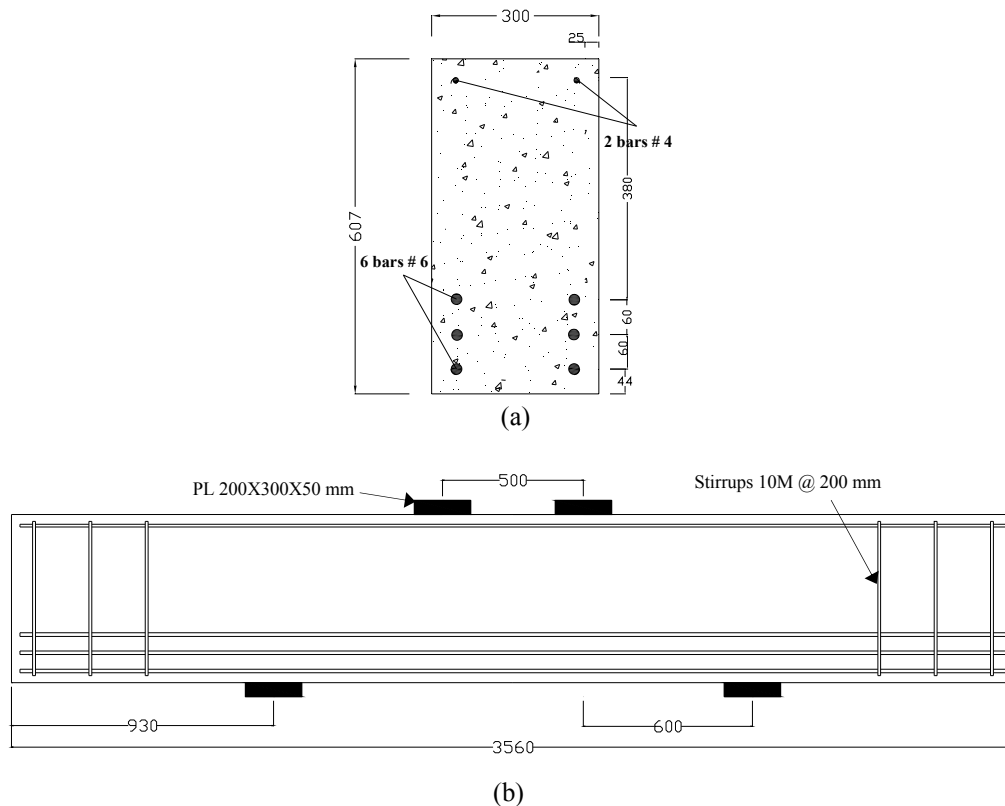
Beam MW1-2: (a) Cross section (b) Elevation
